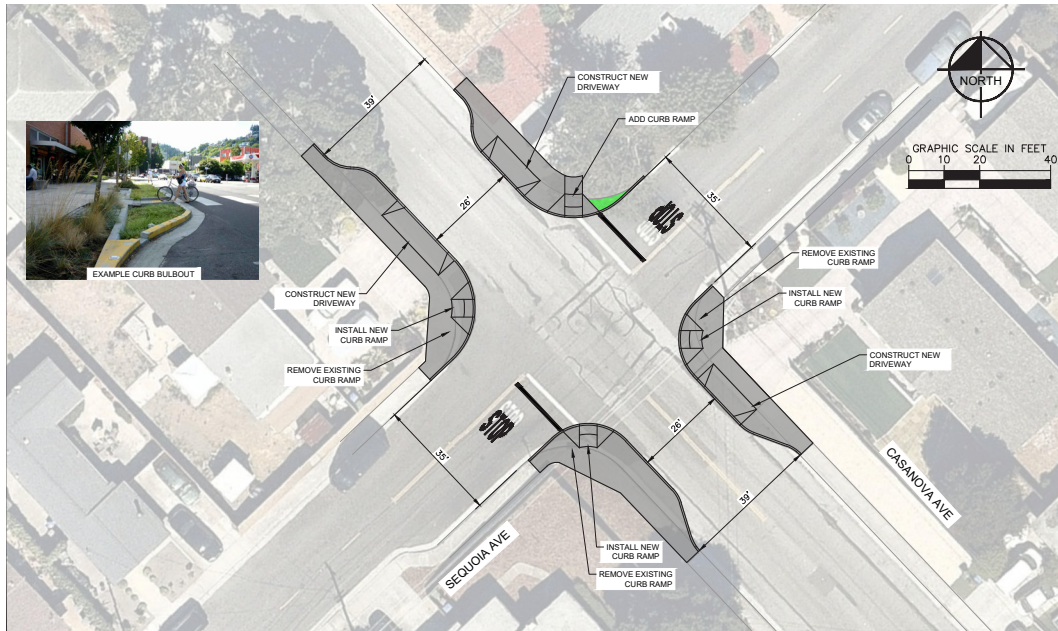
Casanova Avenue and Sequoia Avenue Curb Extension/ Bulbout
